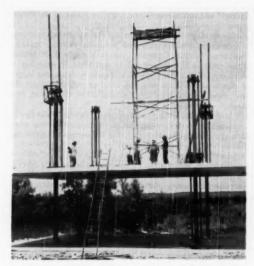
RAISED SECOND-FLOOR SLAB READY FOR WELDING INTO POSITION
